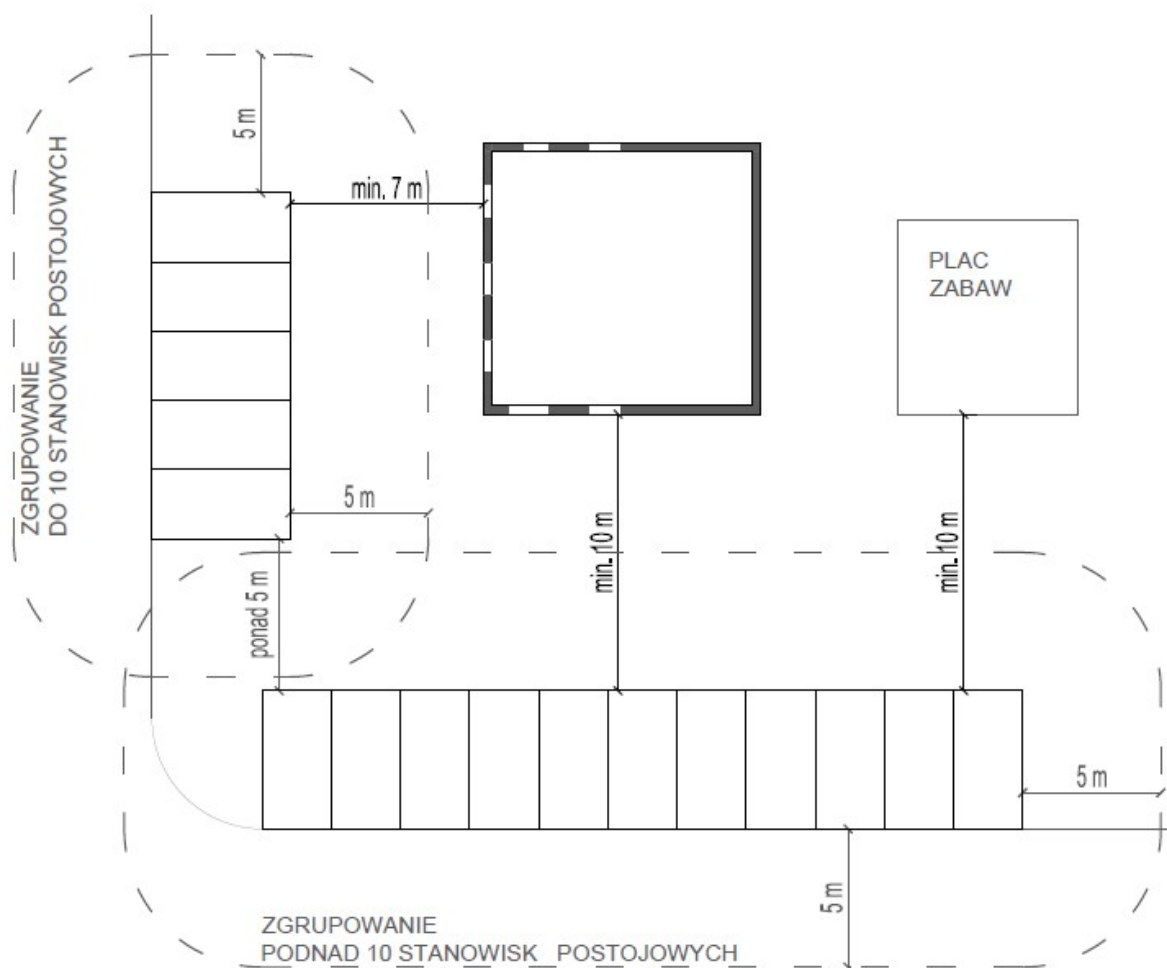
Minimum distance between a parking station and a grouping of parking stations and a children's playground, window or lighting element of a room intended for permanent human residence – § 16 para. 1 point 1 and paragraph. 3 of the Regulation.
